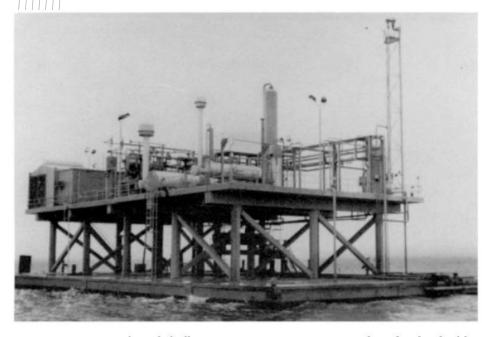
In marsh and shallow water areas it is sometimes beneficial to build the facilities on a concrete barge onshore and then sink the barge on location.
